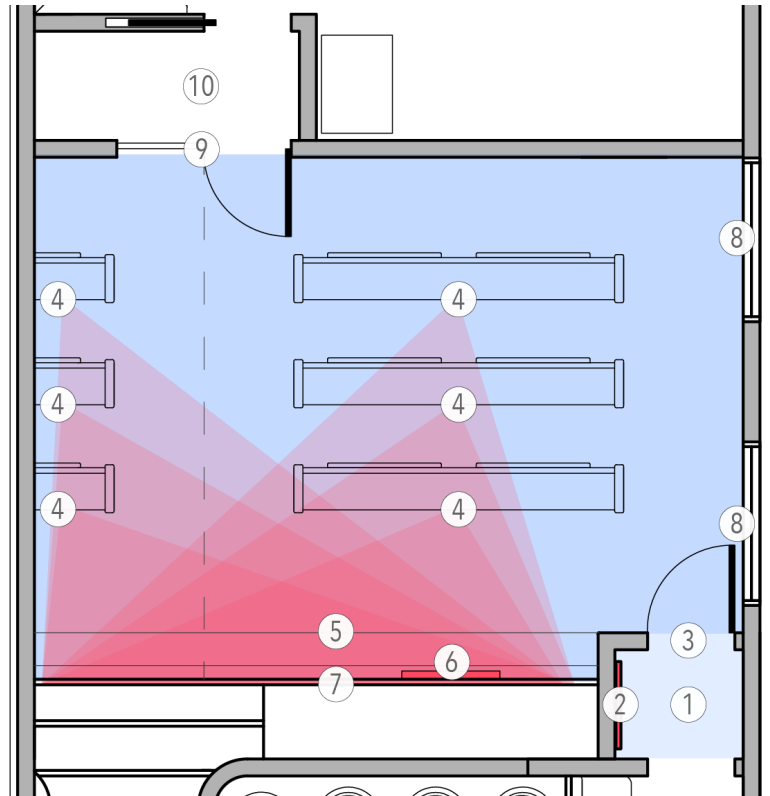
Floor plan for Room #2: AME Fountain Chapel
